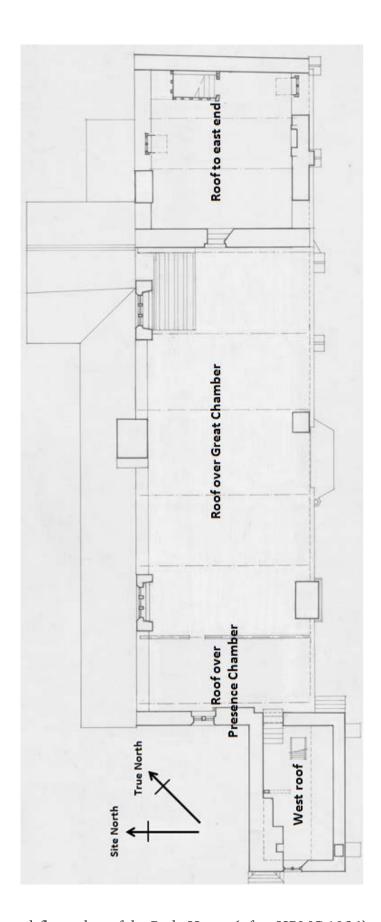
Second-floor plan of the Bede House (after HBMC 1986)
